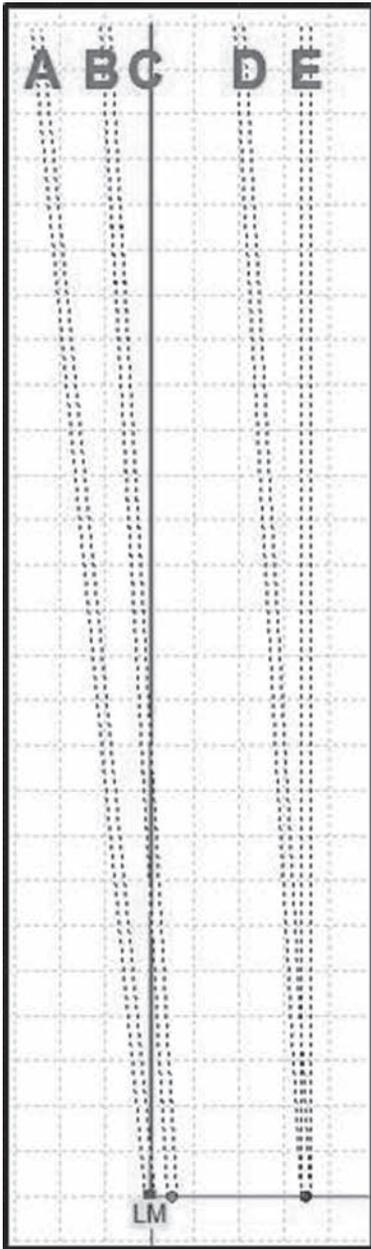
Plan of perimeter drill options on a 5.2 m round.
